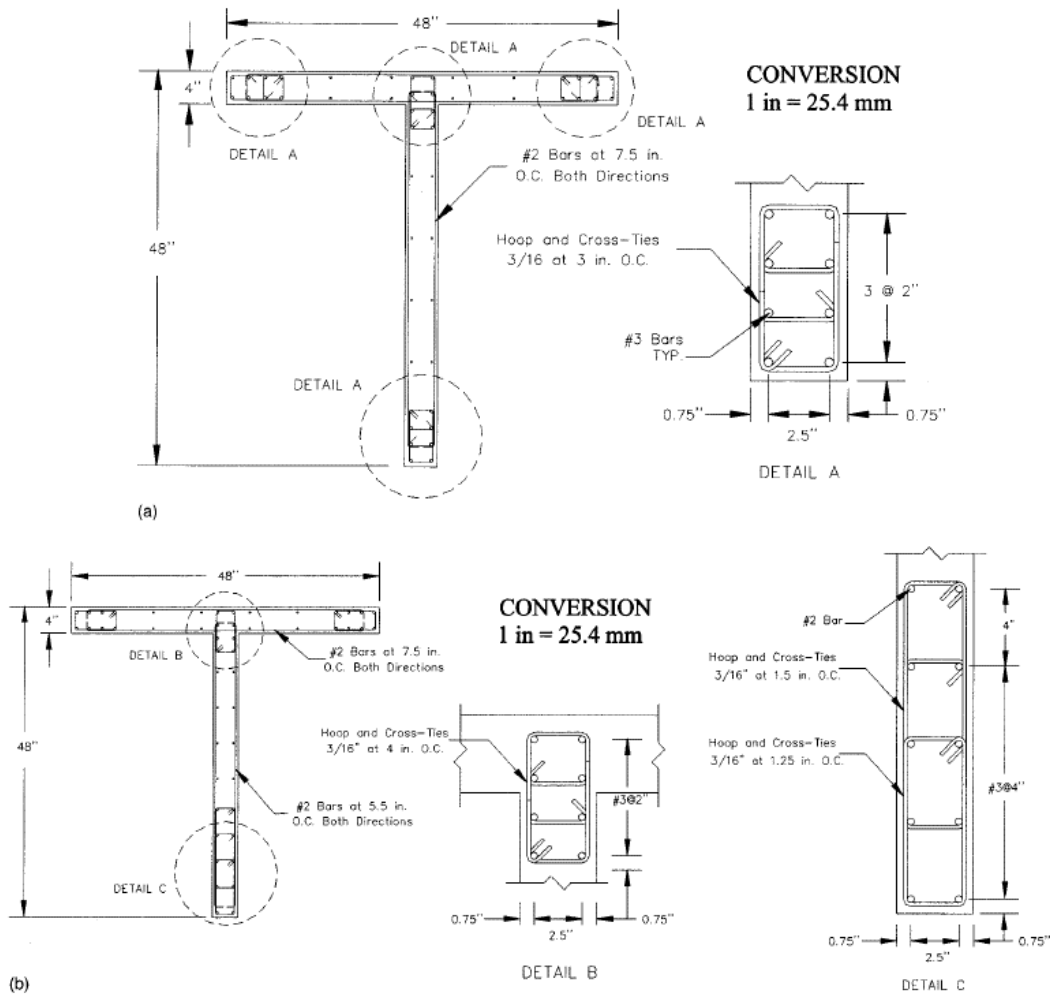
Cross-section details of T-shape walls (TW1 and TW2)
